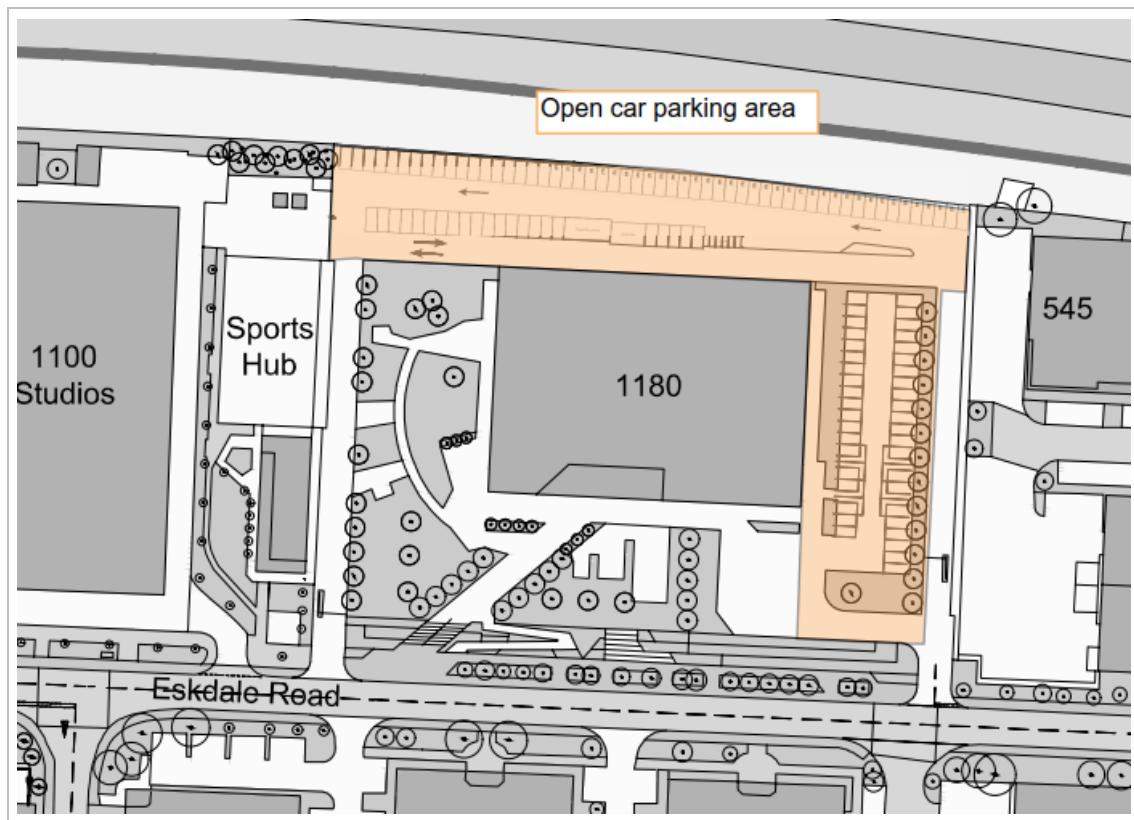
Building 1180 – General layout and surface level/open car parking
